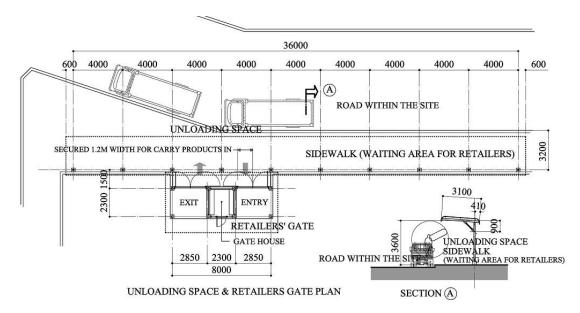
Plans for Unloading Space and Retailers' Gate
